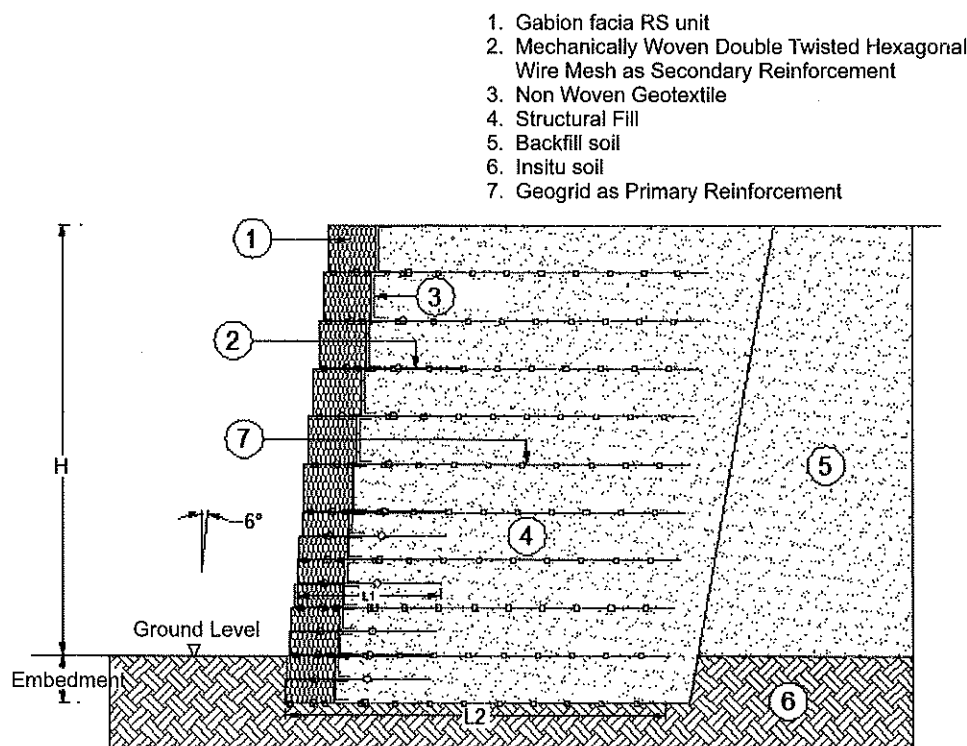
Typical photo of Reinforced Soil Wall with Gabion Facia with Geogrid
